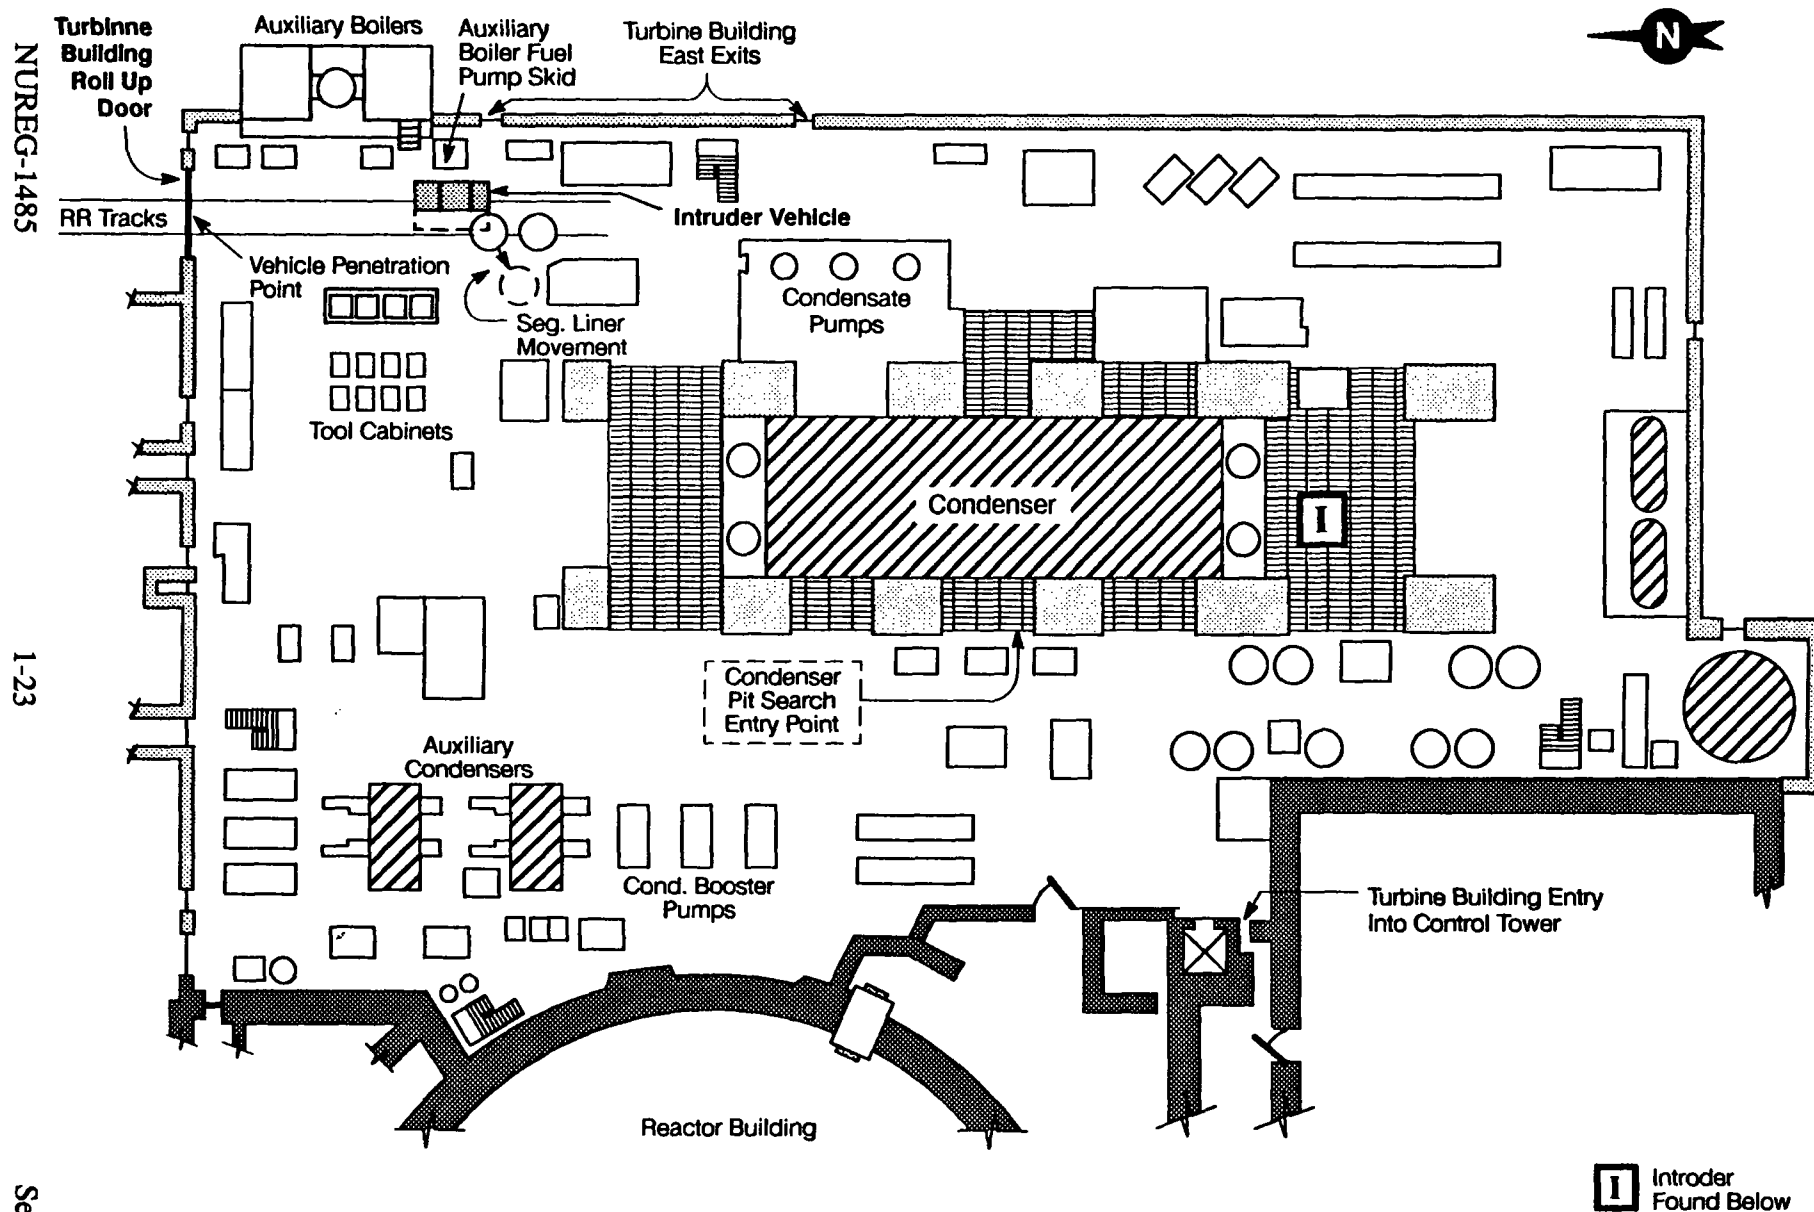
TMI Turbine Building [Elevation 305 feet (93m)]
